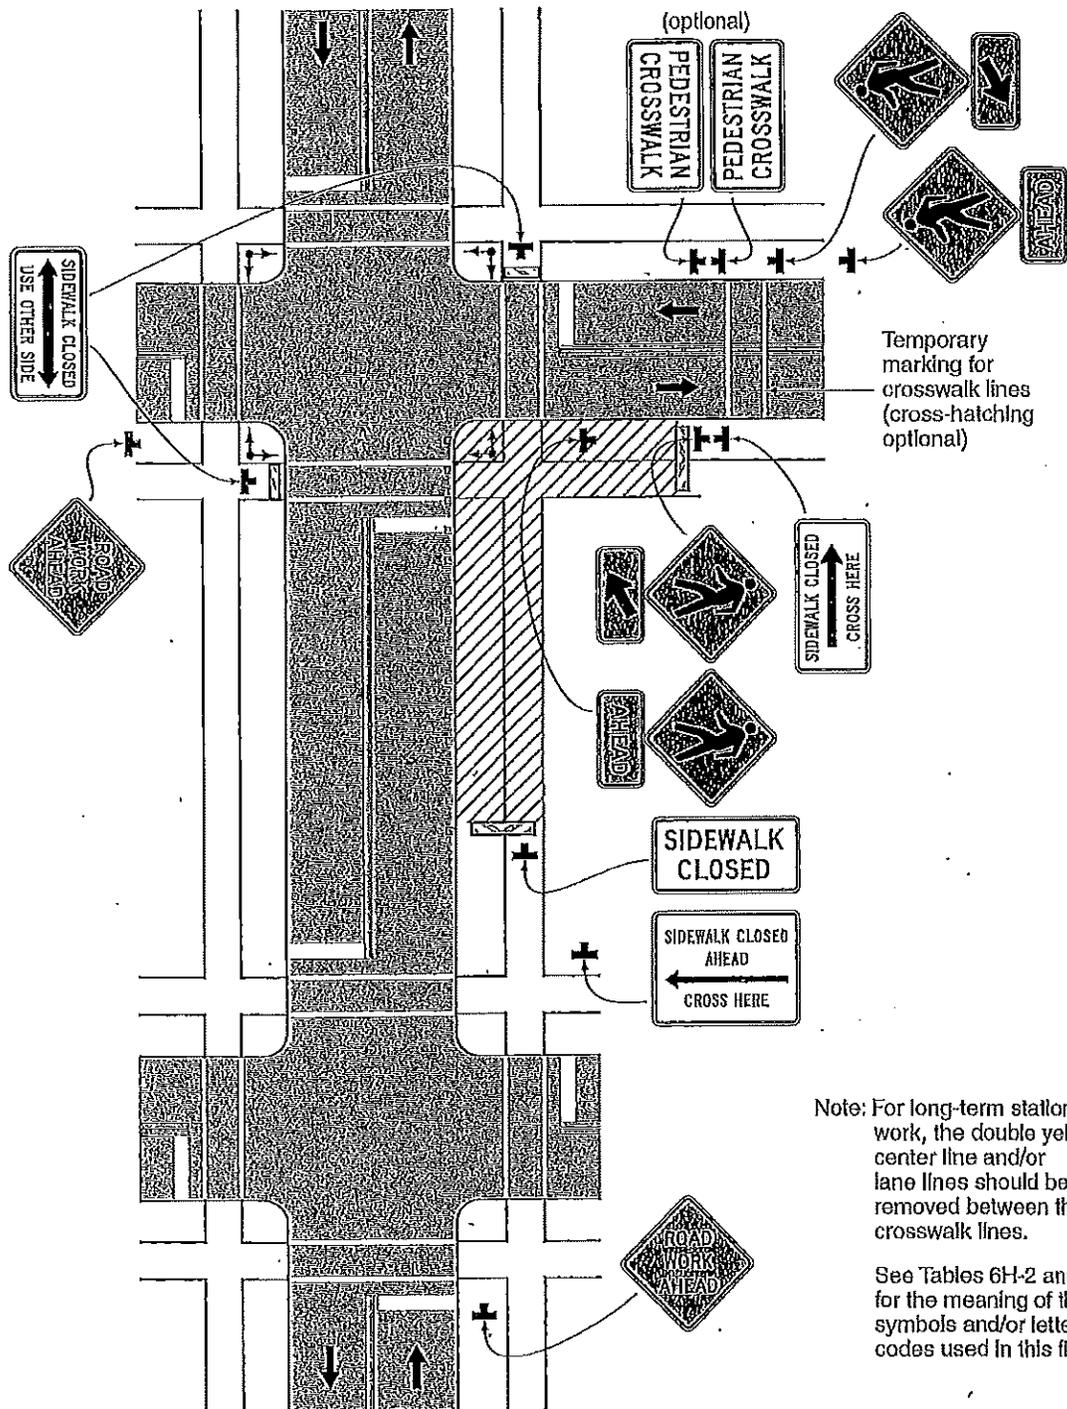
H-28. Sidewalk Detour or Diversion (TA-28)
